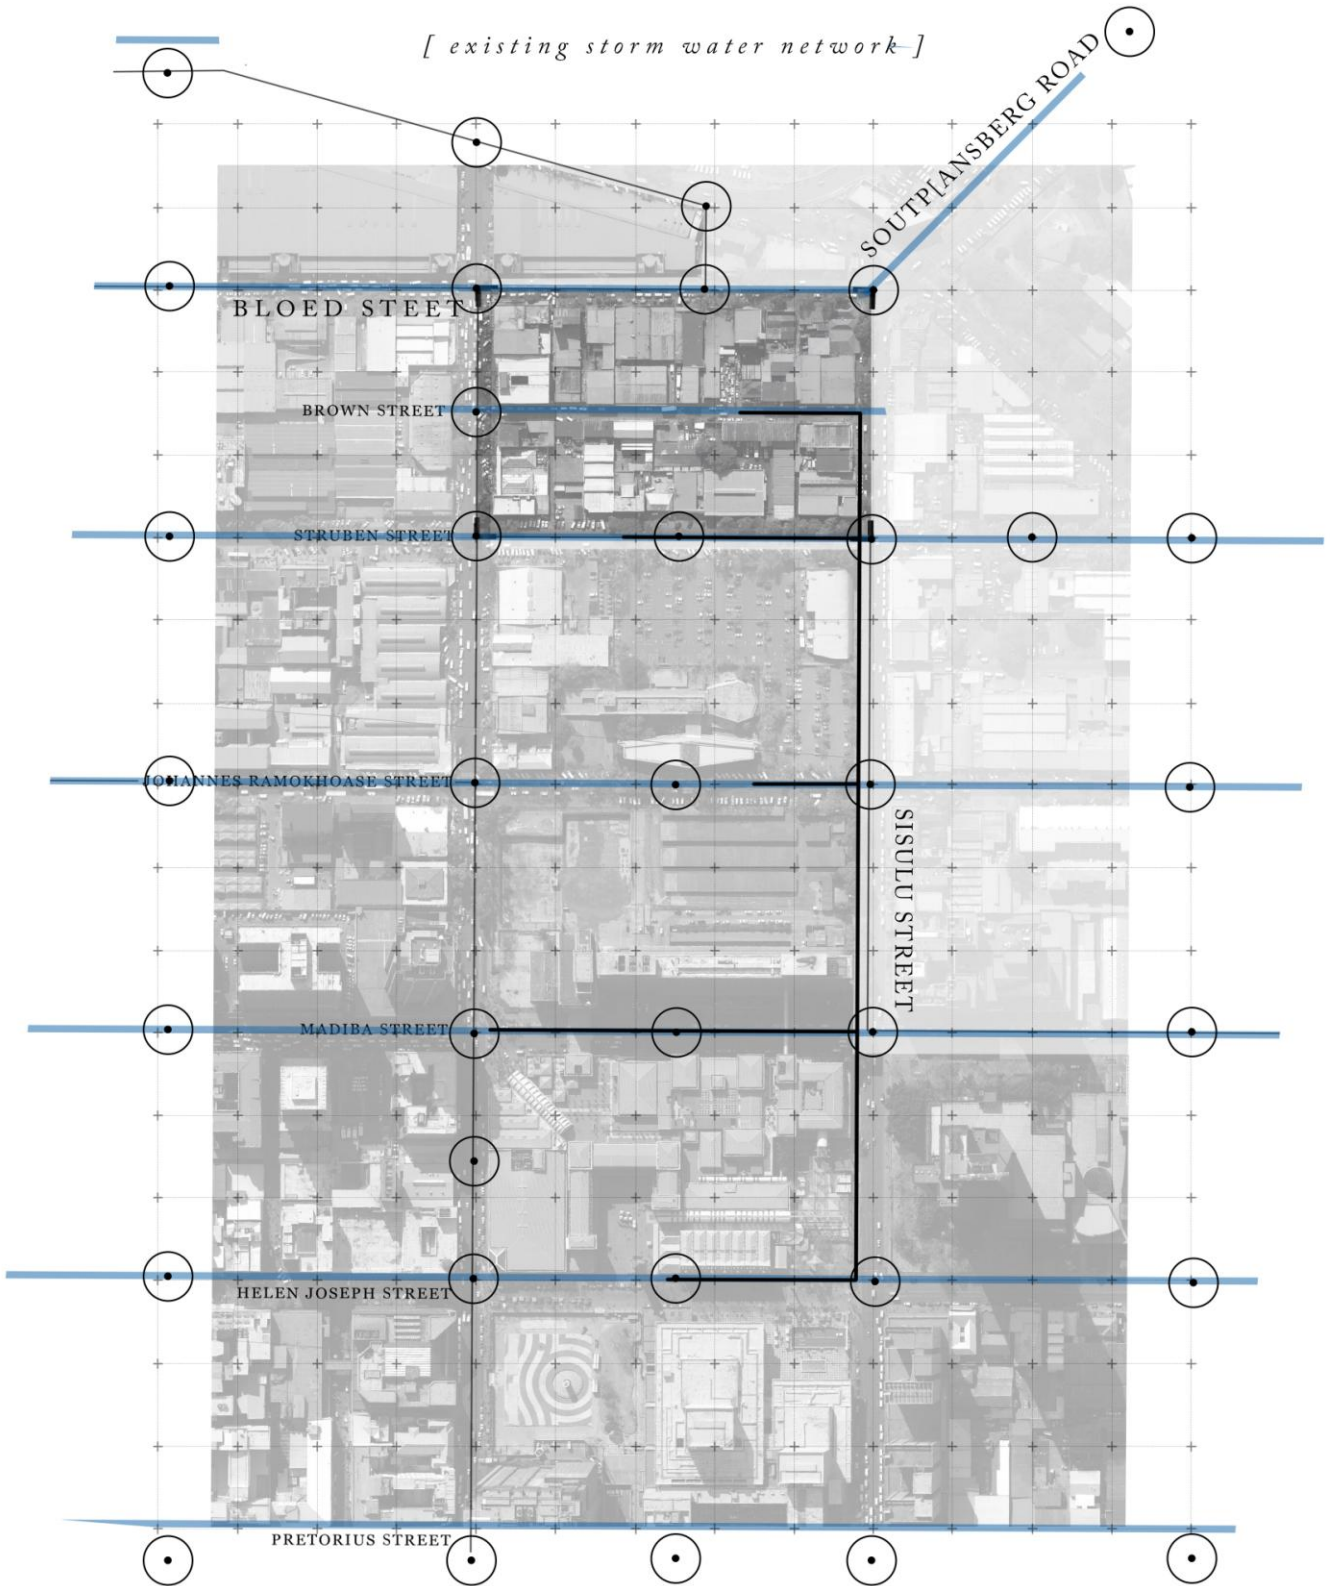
Illustration of Pretoria's storm water network and manhole access points. Based on 1889 plan (Author, 2015).
